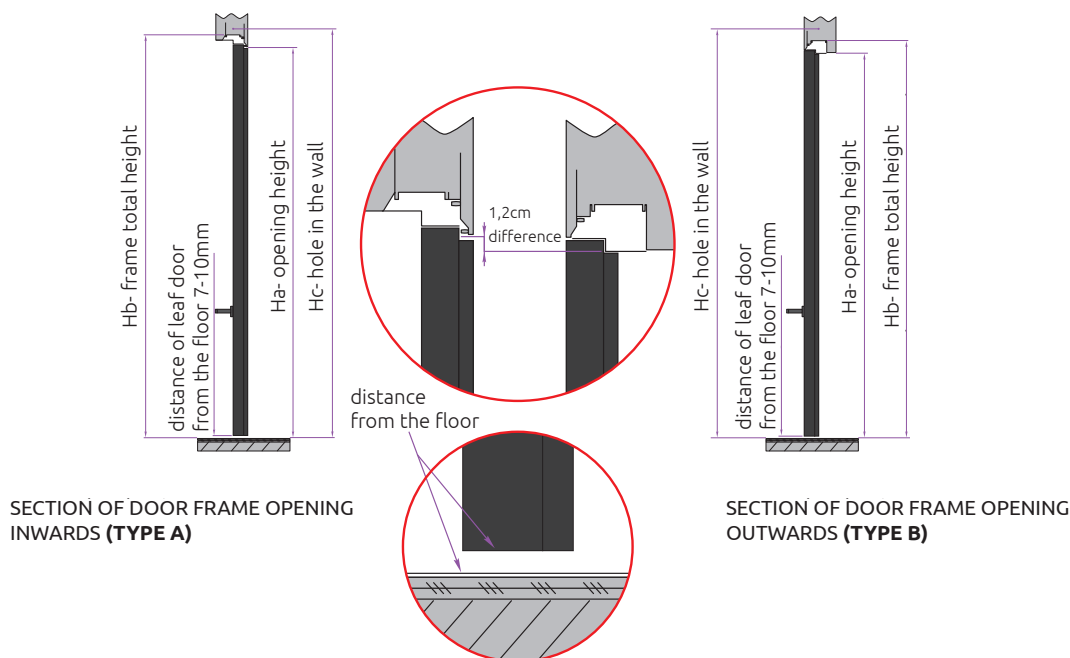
PIU DOOR FLUSHED WITH THE WALL, OPENING OUTWARDS
